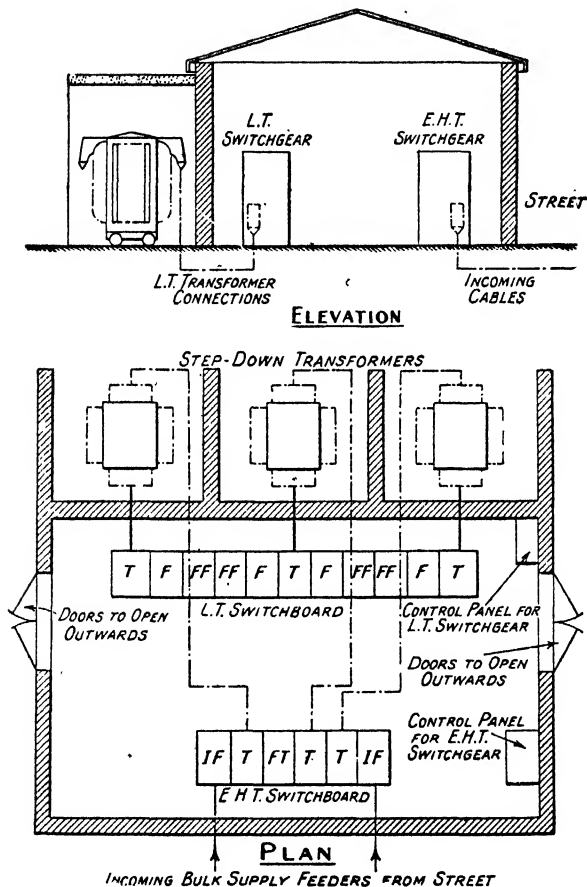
PLAN AND ELEVATION OF MAIN SUB-STATION FOR INDUSTRIAL POWER SYSTEM.
